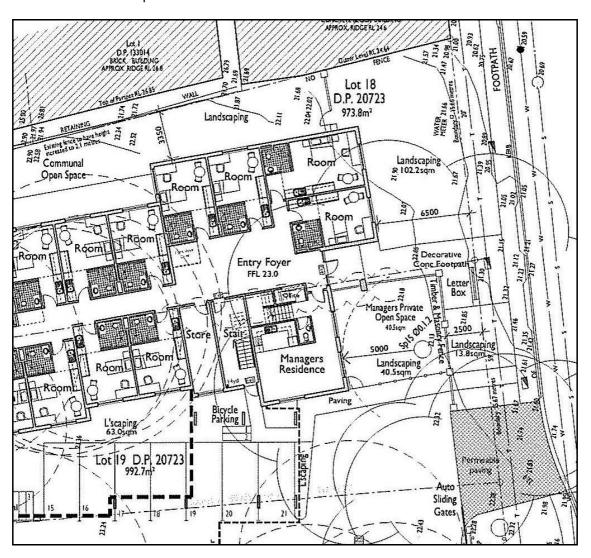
Portion of floor plan showing the previous setback on the eastern side and the previous location of the manager's residence.
